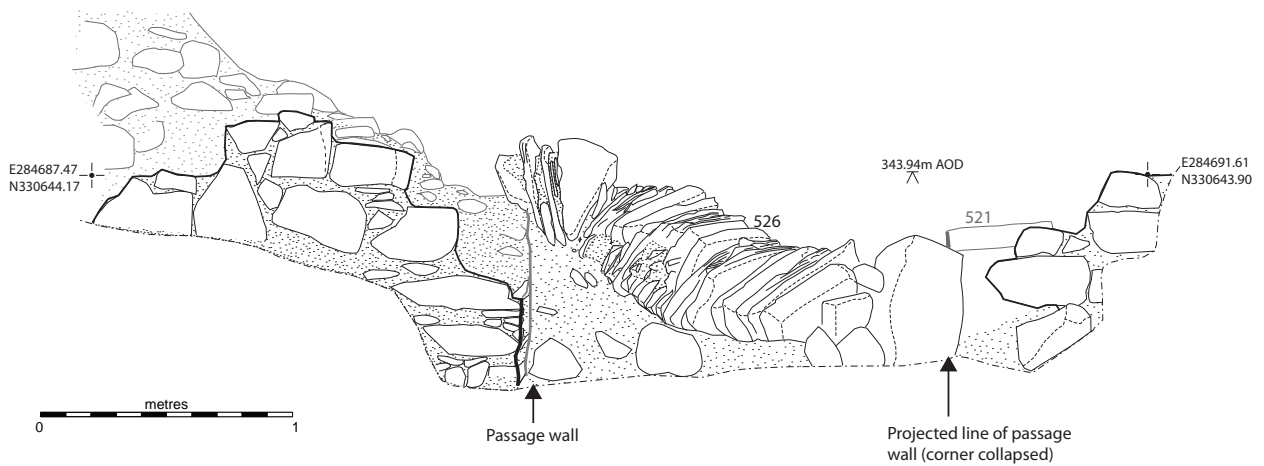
Arch 526, S facing elevation (arch at angle to facing)
